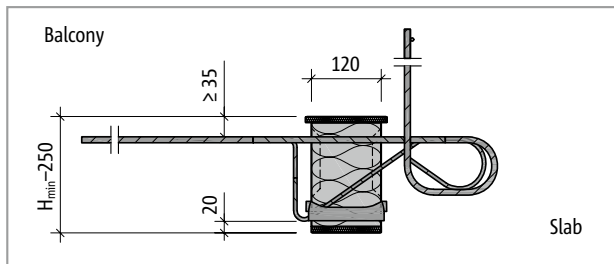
Schöck Isokorb® XT type K-WO: Product section
